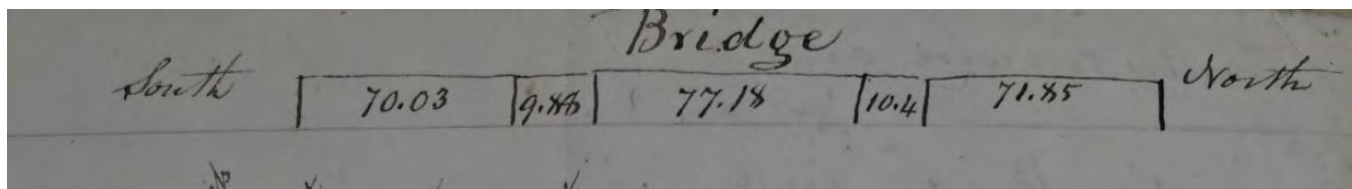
A rough sketch plan for the 1829 Burlington-Winooski bridge by John Johnson (Johnson 1829).
